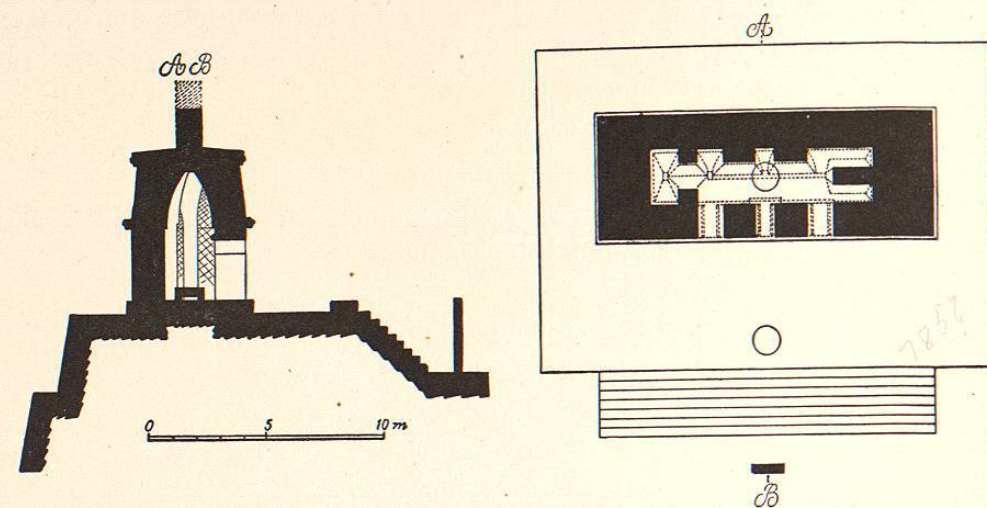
STRUCTURE 39: SECTION AND GROUND-PLAN (RESTORED).
